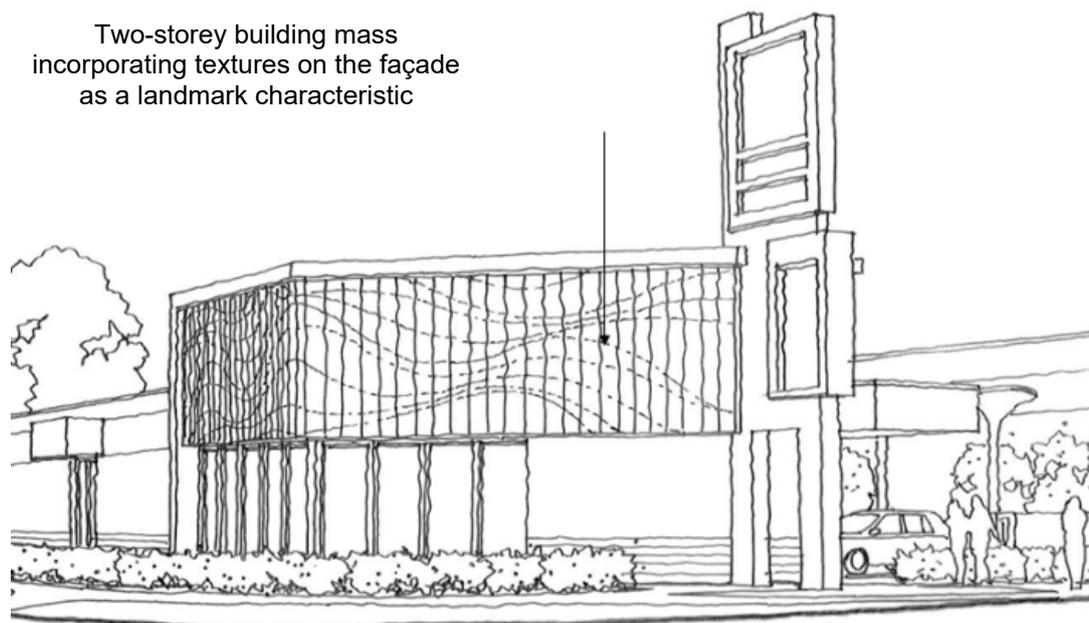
Landmark corner site emphasised by means of greater building mass and a distinctive architectural design.
